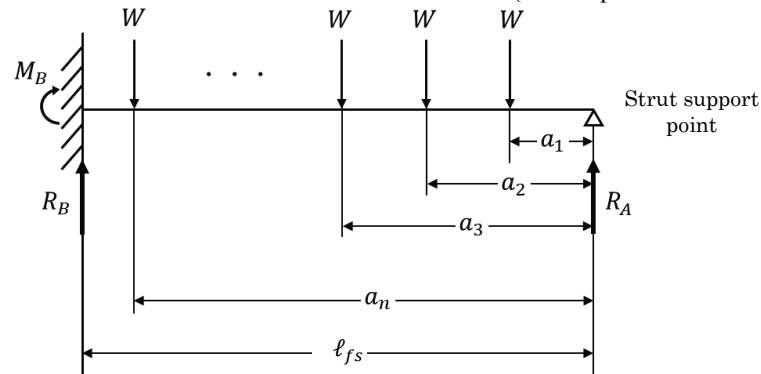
Load Conditions Between Girders and Struts (Non-Equidistant Load Points)
